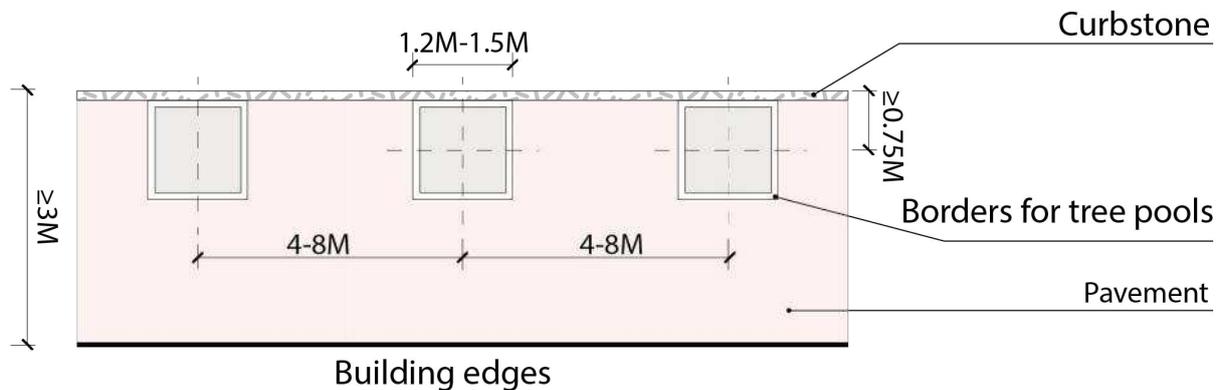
Suggested dimensions for tree pits on Tianhe Nanyi Road.(Source: Completed by author)
